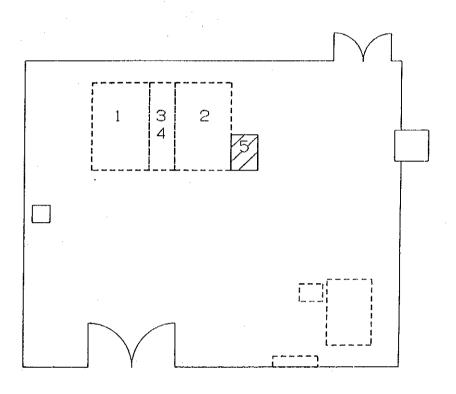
SITE LAYOUT CHAKE CHAKE STATION
